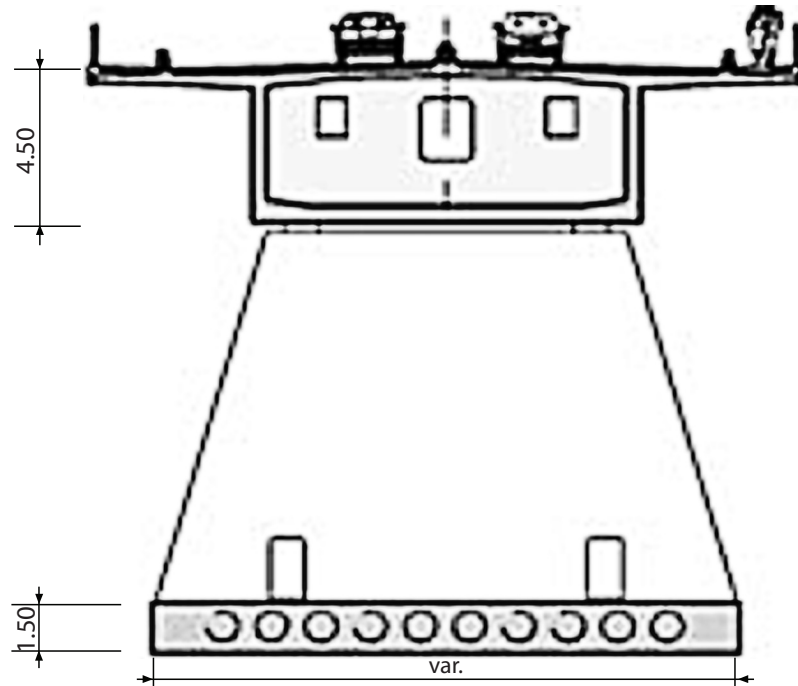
B- Infant Henrique Bridge (Fonseca, Mato) Cross Section I: 200
